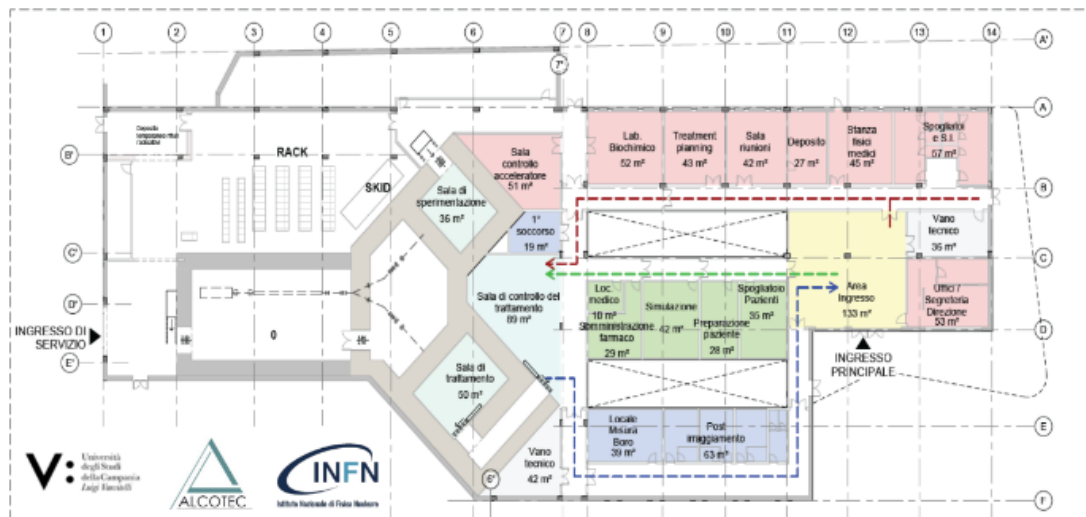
Building plan of ANTHEM project facility for BNCT in Caserta.
